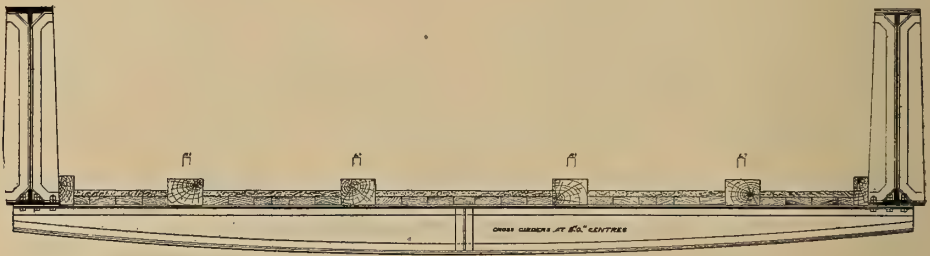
OLD TYPE OF FLOOR. SUSPENDED CROSS GIRDERS, TIMBER DECKING AND WAY BEAMS
